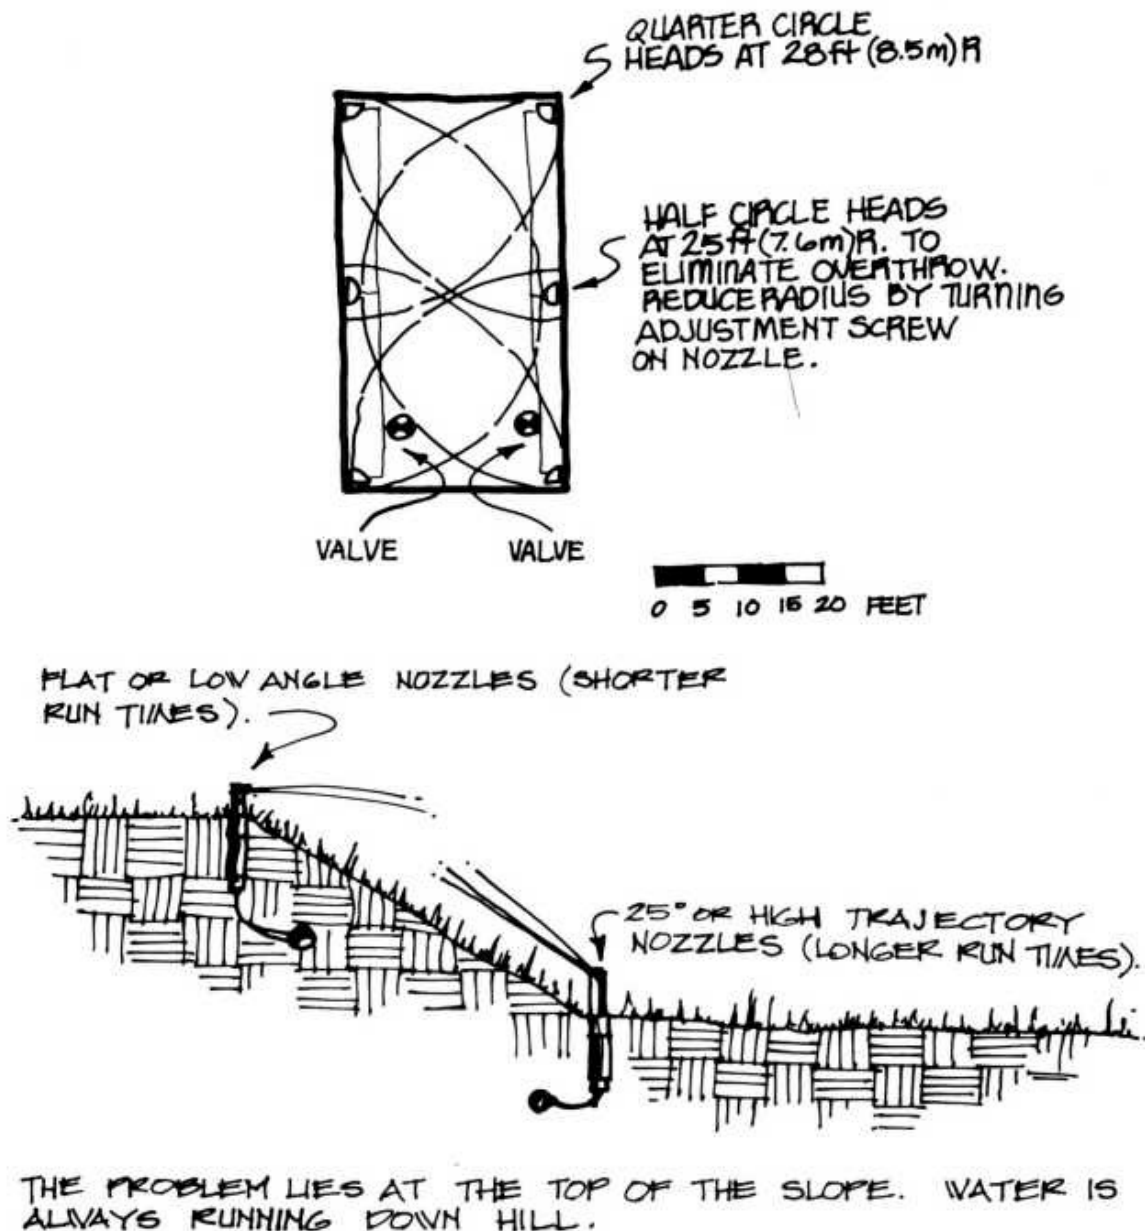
Area 3-layout of Super 700 Rotor heads.
